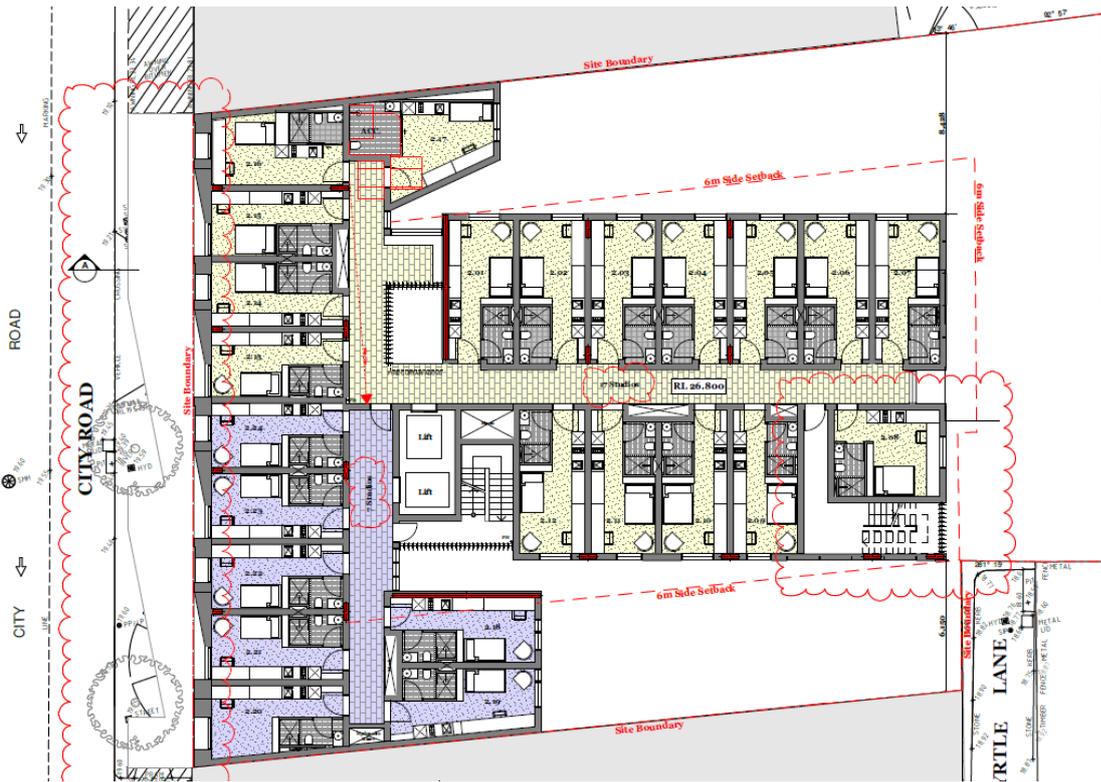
A typical floor containing boarding rooms (Foyer51 in yellow and SGCH in purple)
